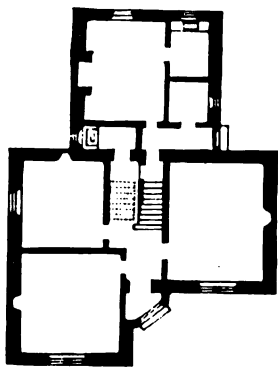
PLAN OF MODERN GOTHIC VILLA.
